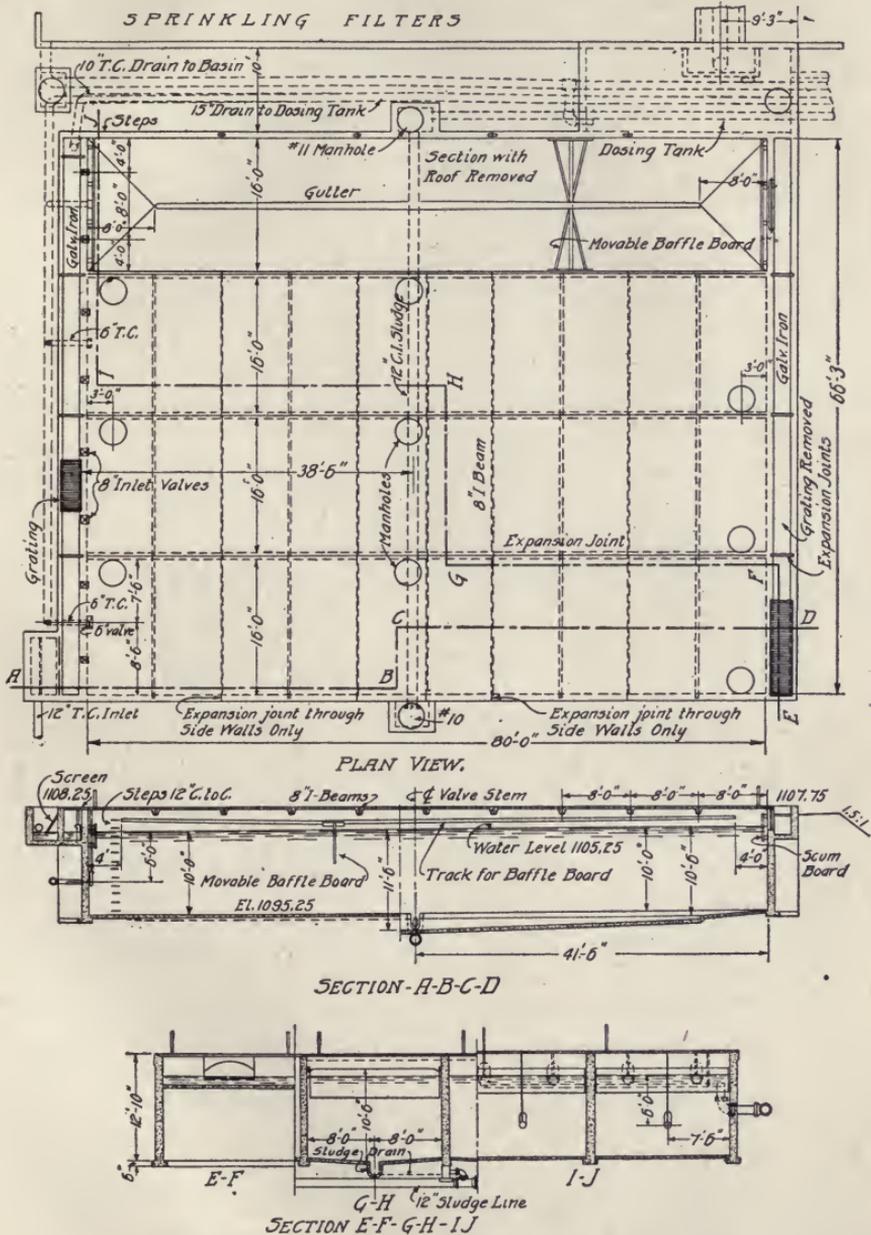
Detailed Plan and Sections of Covered Settling Tanks
